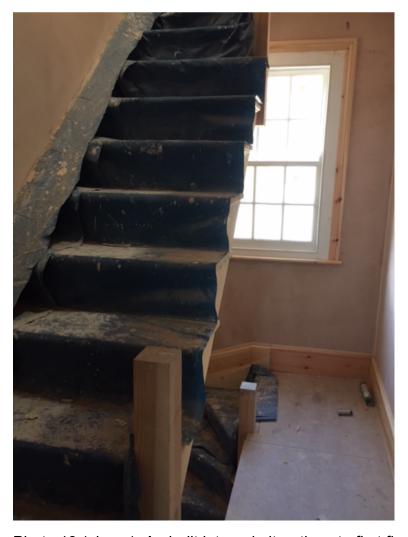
(above): As-built internal alterations to first floor landing including staircase, flooring, skirting boards, architraves and window. Plastering proposed to be retained, other elements to be replaced or altered
